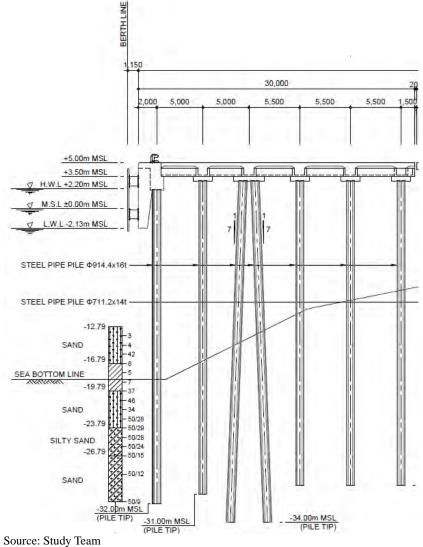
Section view of the Heavy Equipment Unloading Berth
